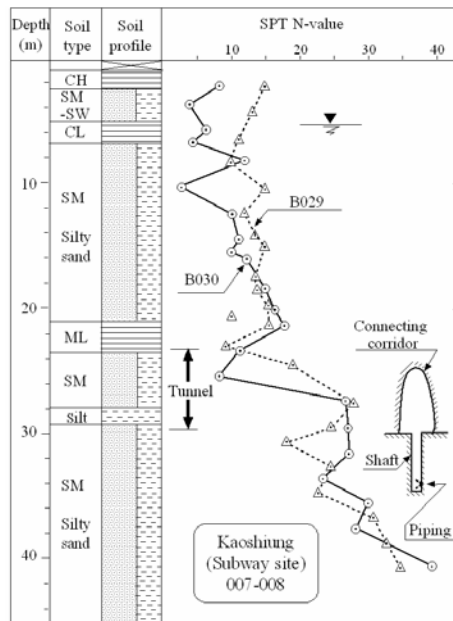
Soil profile at the site of collapse (Ishihara & Lee, 2008).
